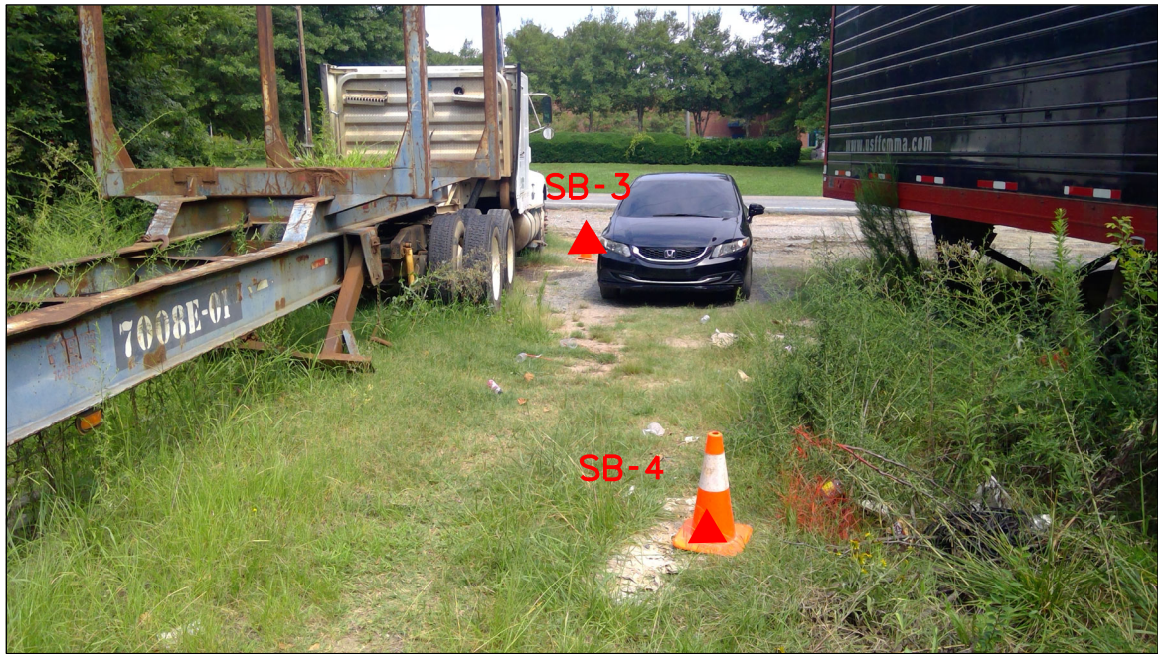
VIEW OF SOIL BORING LOOKING EAST
